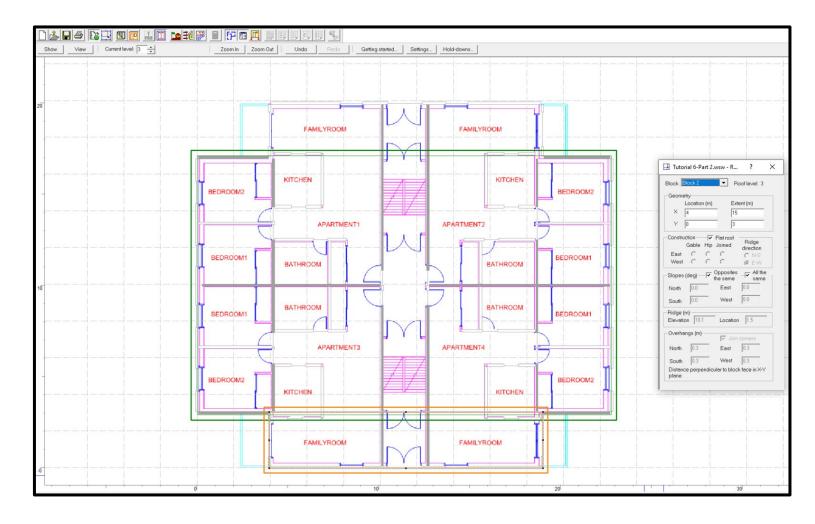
Shearwalls Tutorial 6 – Second Roof Block
